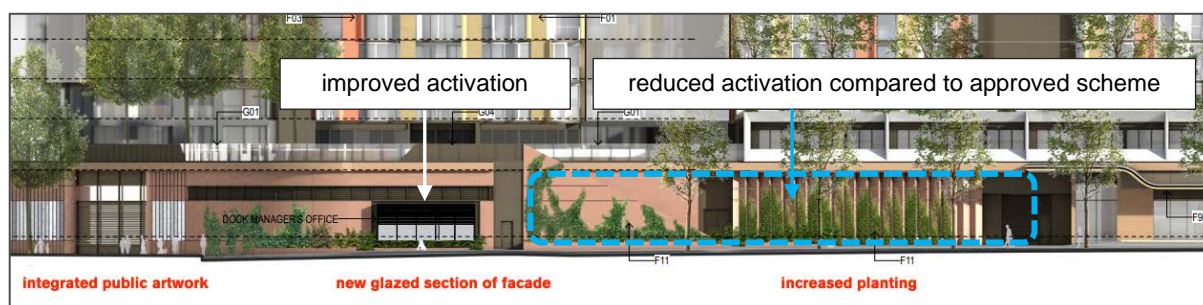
| Southern end of western elevation facing Barber Avenue showing proposed treatments to minimise impacts of blank / inactive facades (Base image source: Proponent's RtS)
